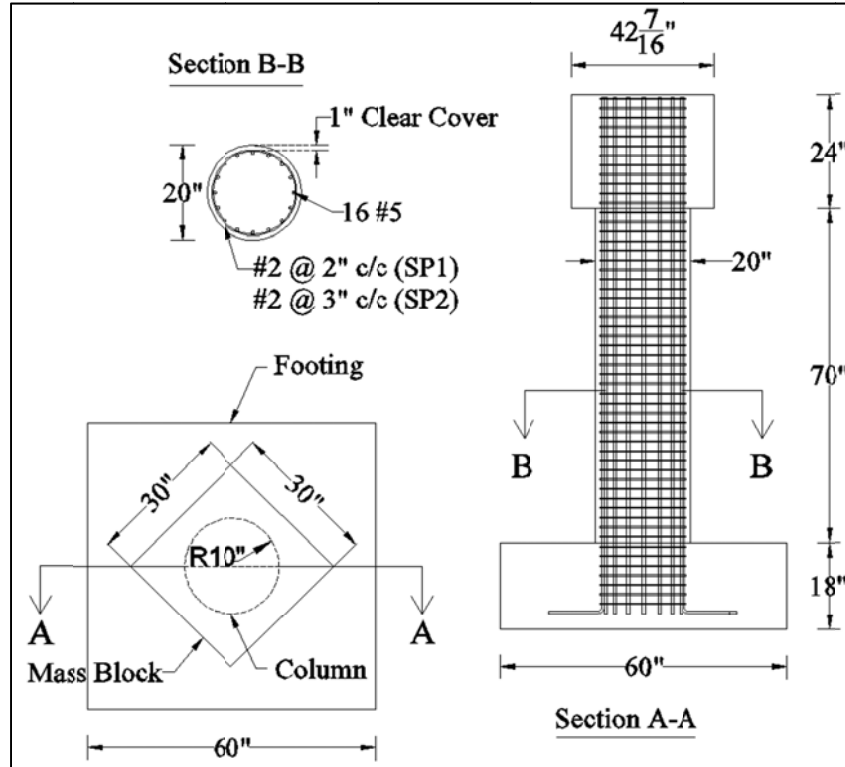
Section, elevation and top view of the as-built test specimens.
